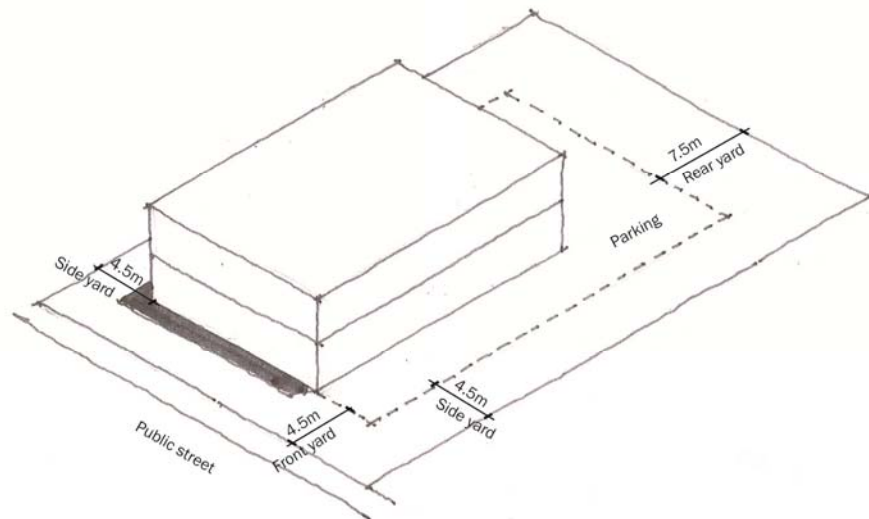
Principal Building Development Standards in the C-DT2 Zone
